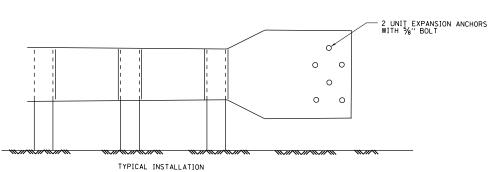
DETAIL OF CONNECTION OF GUARDRAIL TO SQUARE BRIDGE PIER OR FOUNDATION.
